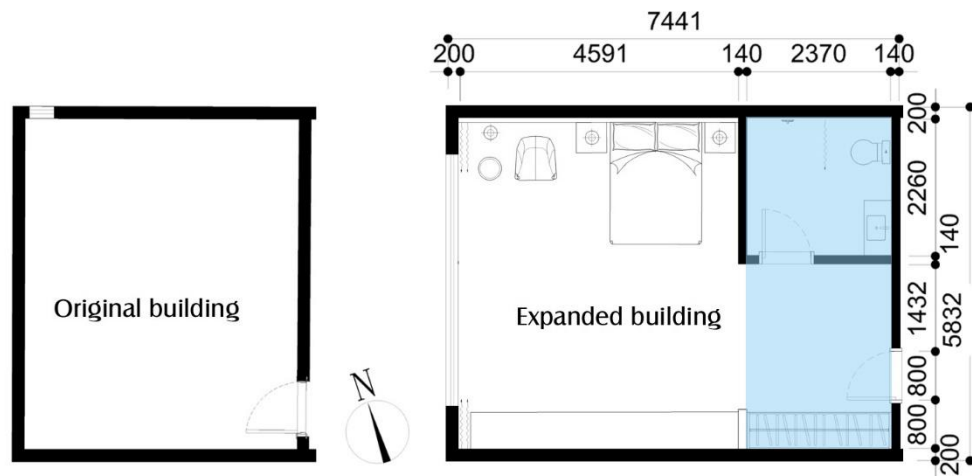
Senior Housing 2 Original and Expanded Floor Plan
